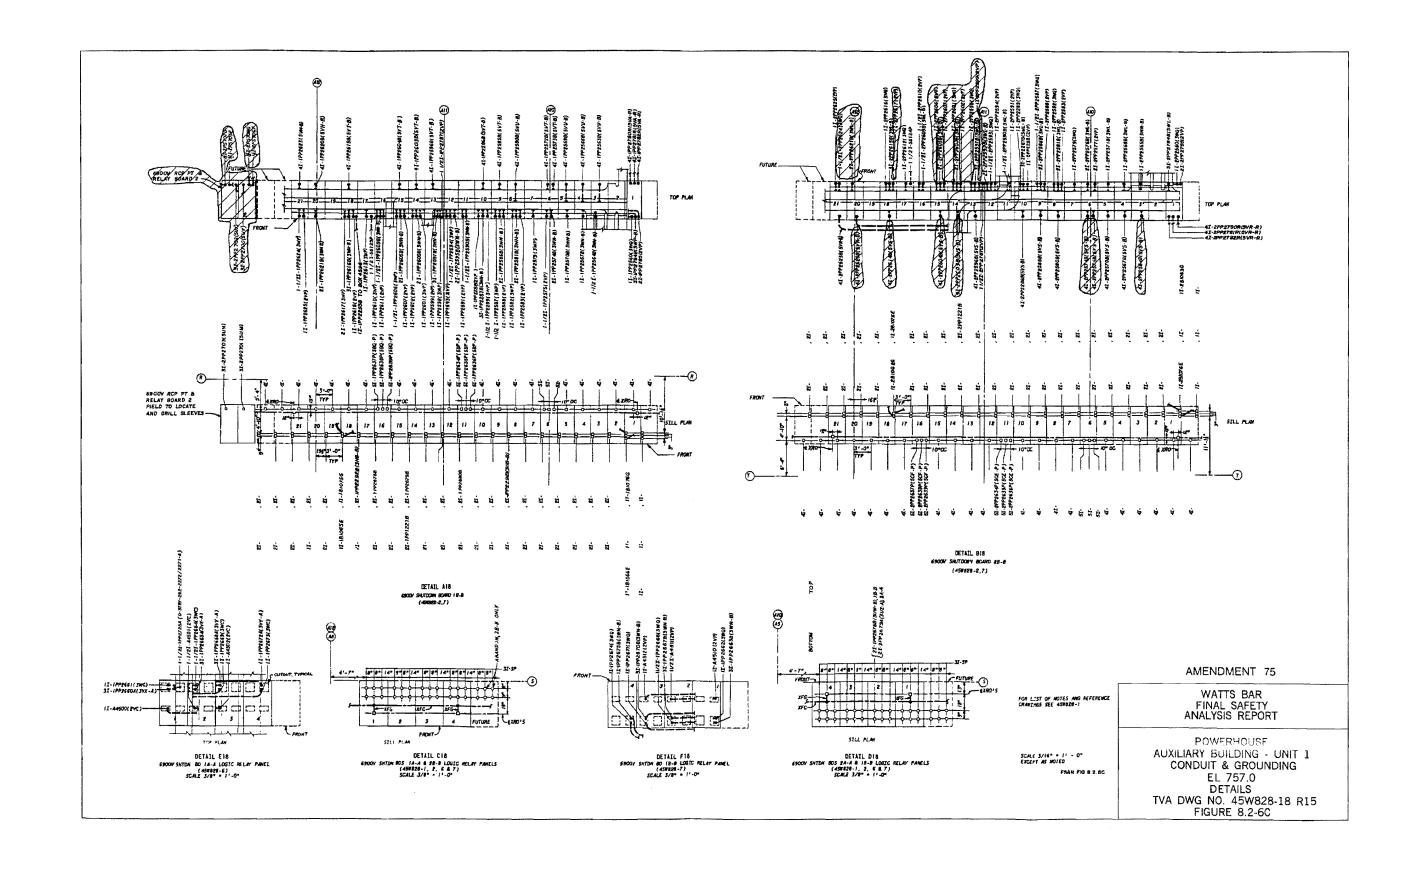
Powerhouse Auxiliary Building - Unit 1 Conduit and Grounding EL. 757.0 Details
